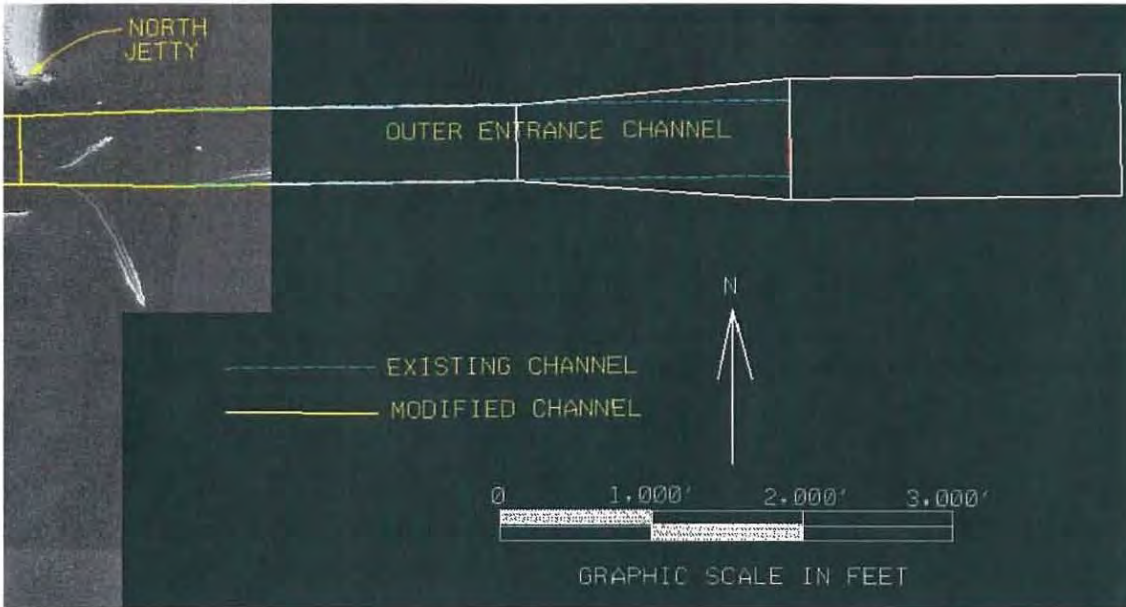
Proposed plan to deepen, widen, and extend the OEC.
